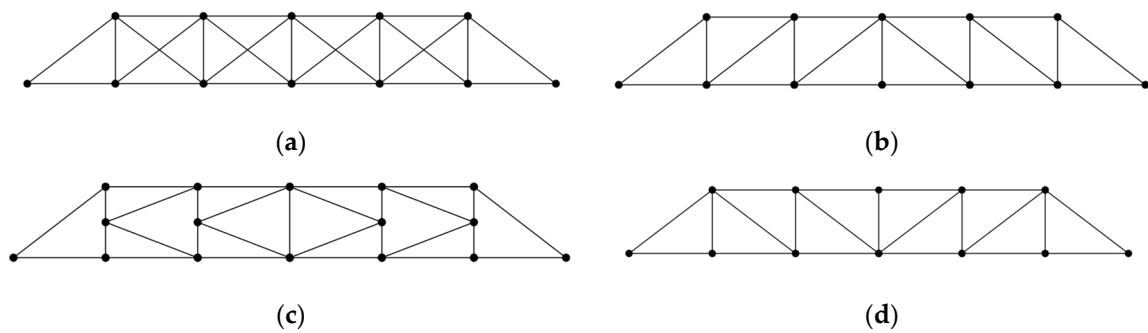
Parallel chord trusses: (a) Brown truss, (b) Howe truss, (c) K truss, and (d) Pratt truss.
